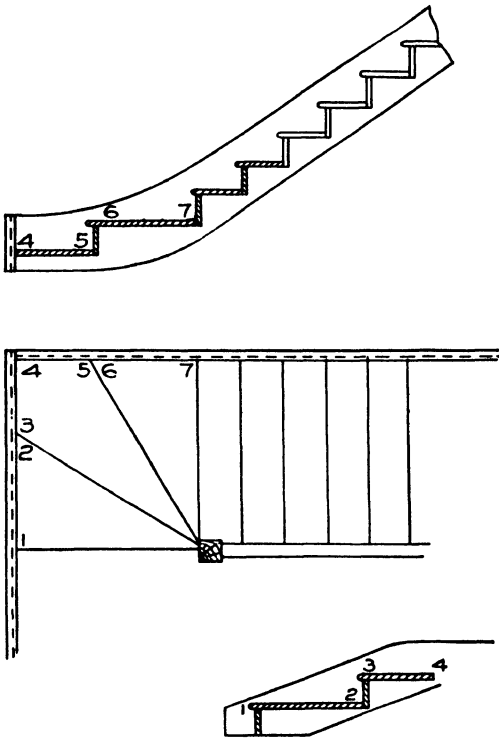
Elevation and Plan of Dog-Legged Stair Showing Three Winders and Six Flyers
